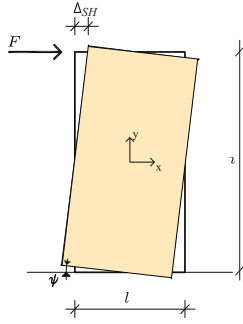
Sheathing-to-framing connections contribution (from [37]).
